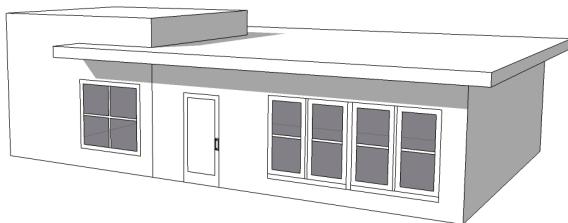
Flat roof example with interrupting vertical wall on left side
